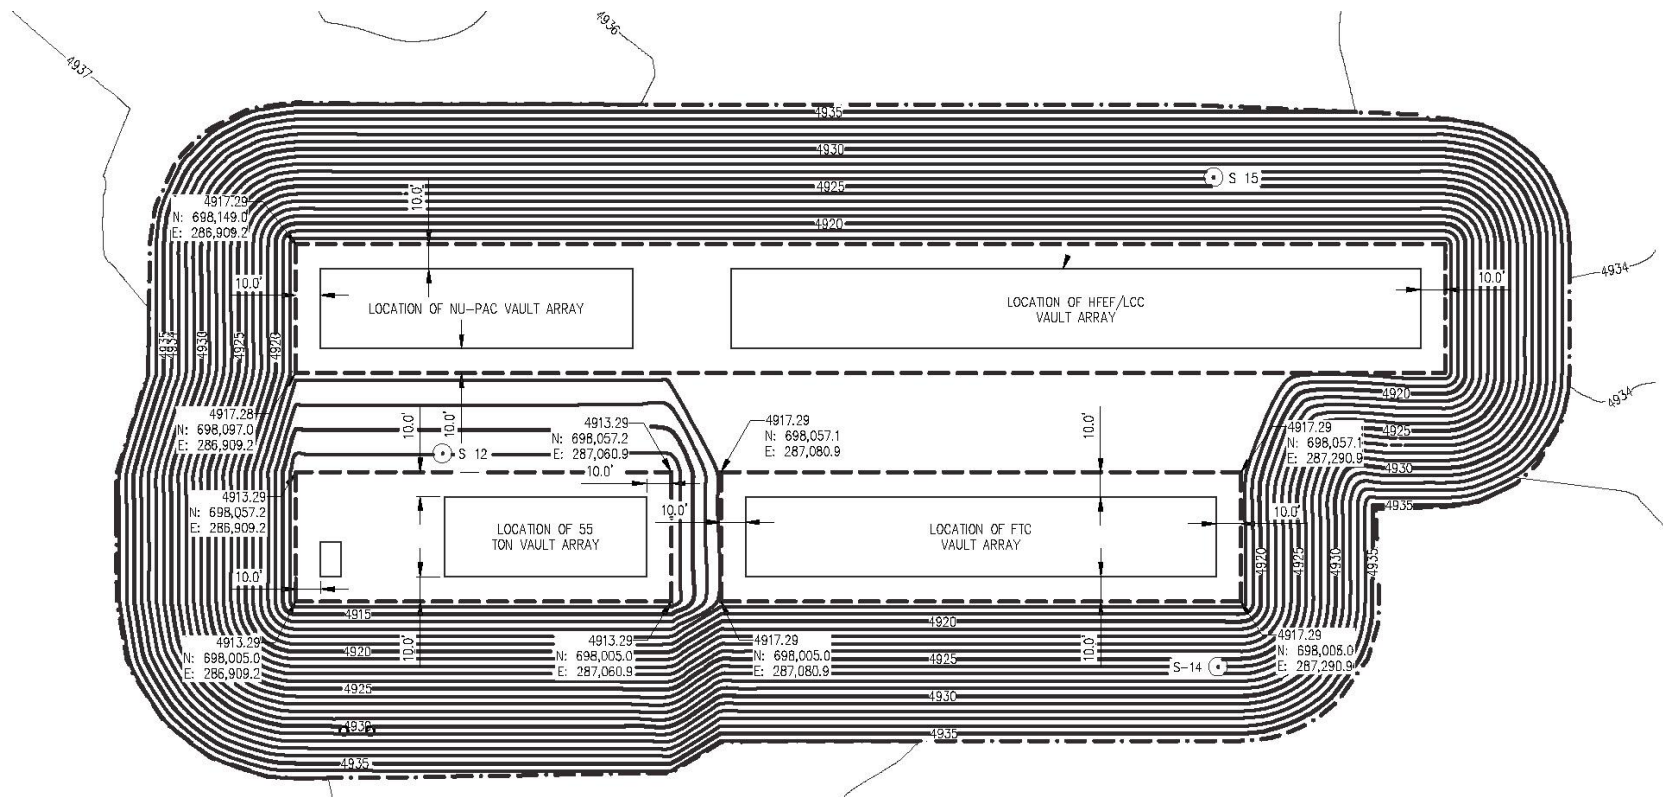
Excavation plan for the vault arrays showing the lateral extent of the excavation area (from Drawing 778766).
